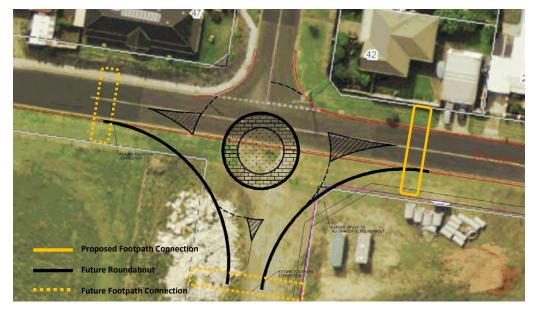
Concept Intersection Treatment, Baynes Street / Lindsay Street
